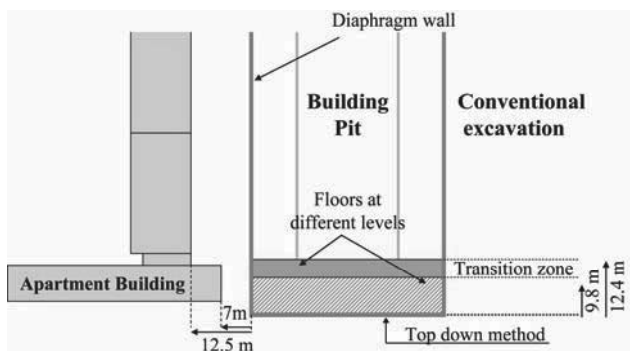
The cross-sections of the building pit that were considered with the Plaxis 2D computer code.
